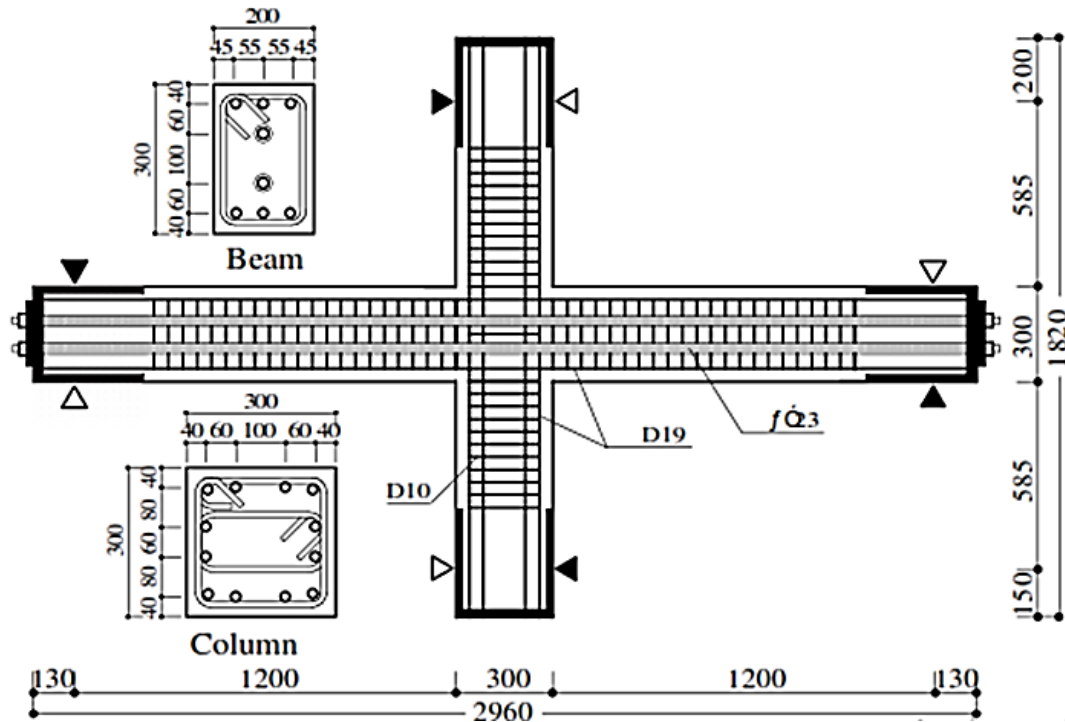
Sectional detail, reinforcement layout, and test setup of the PPC interior BCJ
